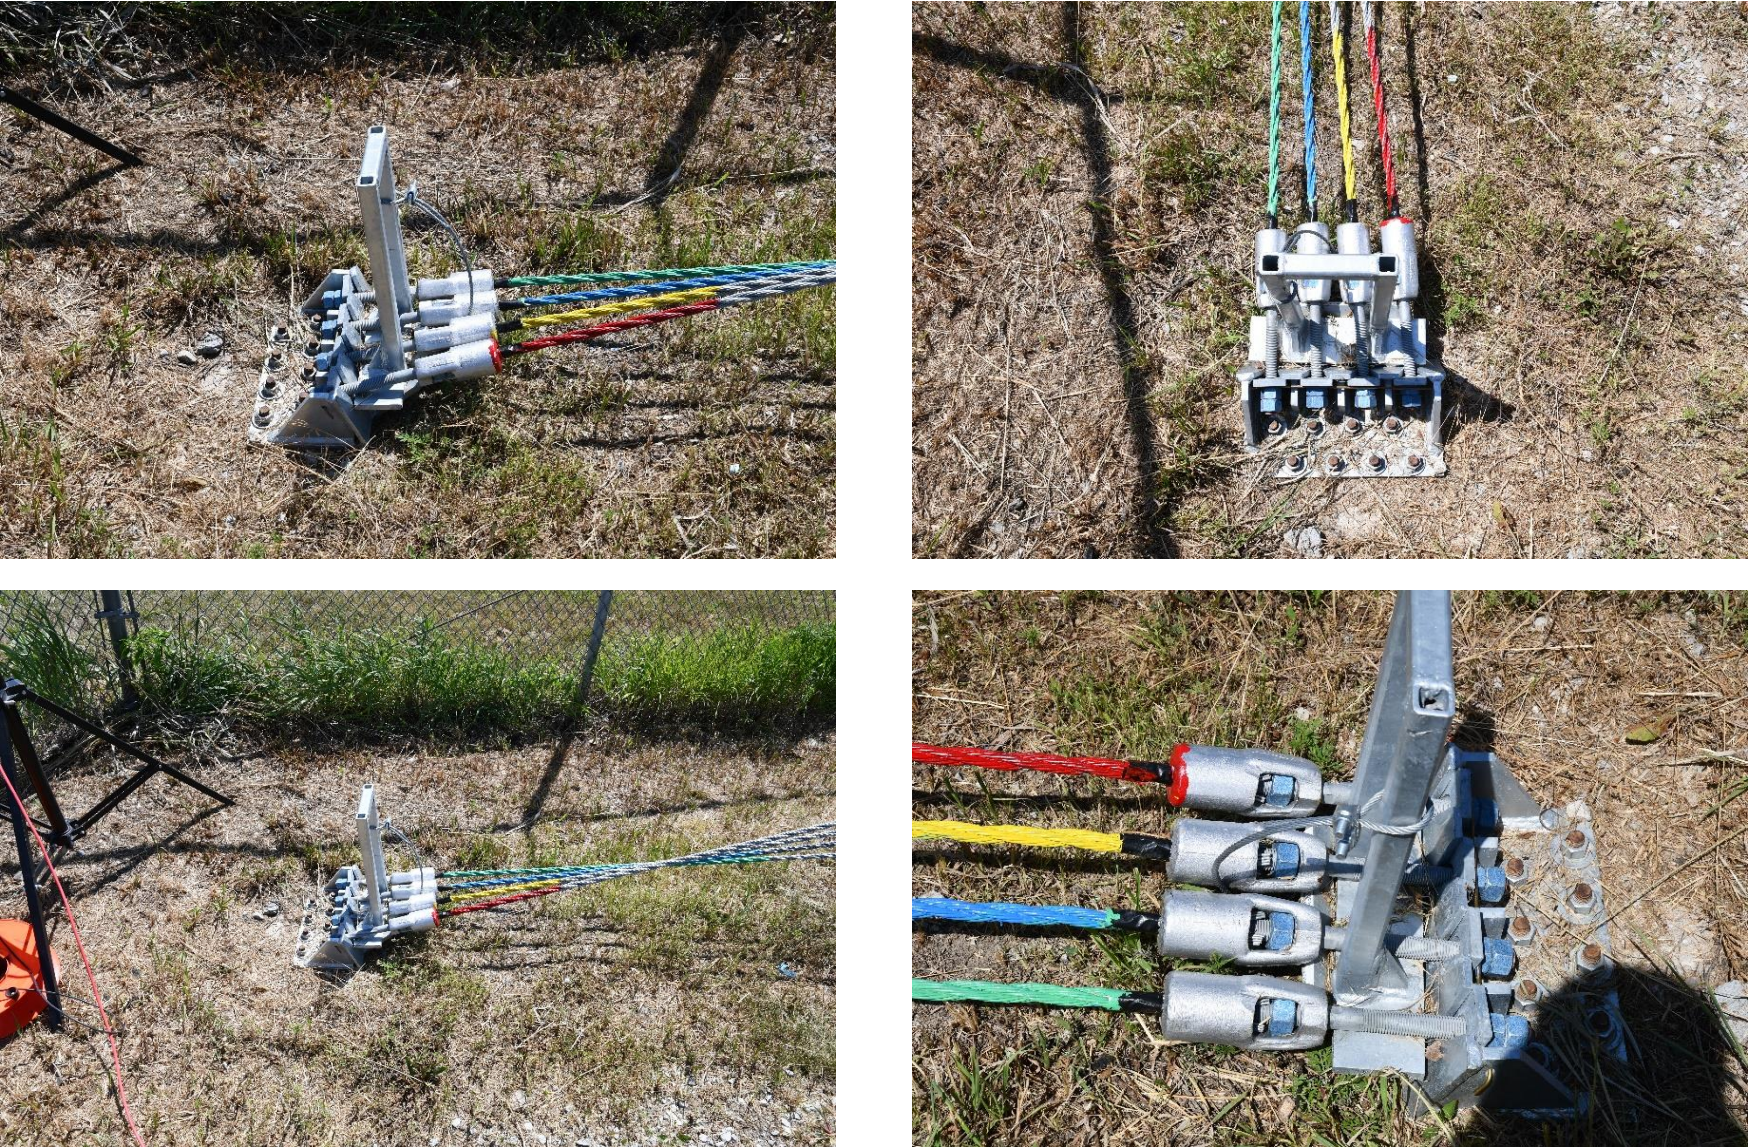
System Installation – Downstream Anchorage, Test No. MTP-2
